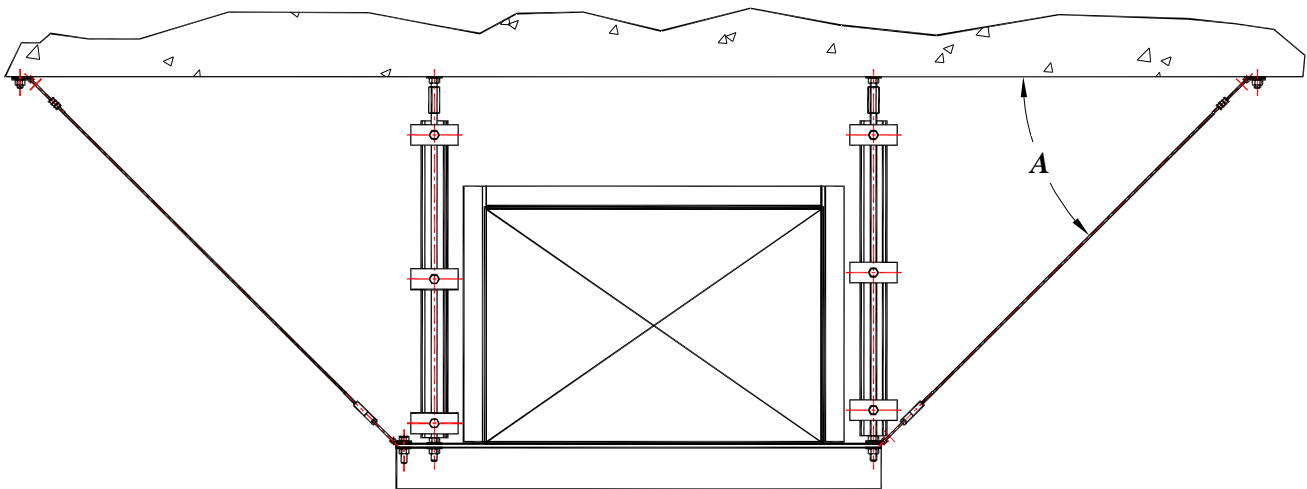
; Typical Transverse Seismic Restraint Arrangement for Trapeze Supported Duct
